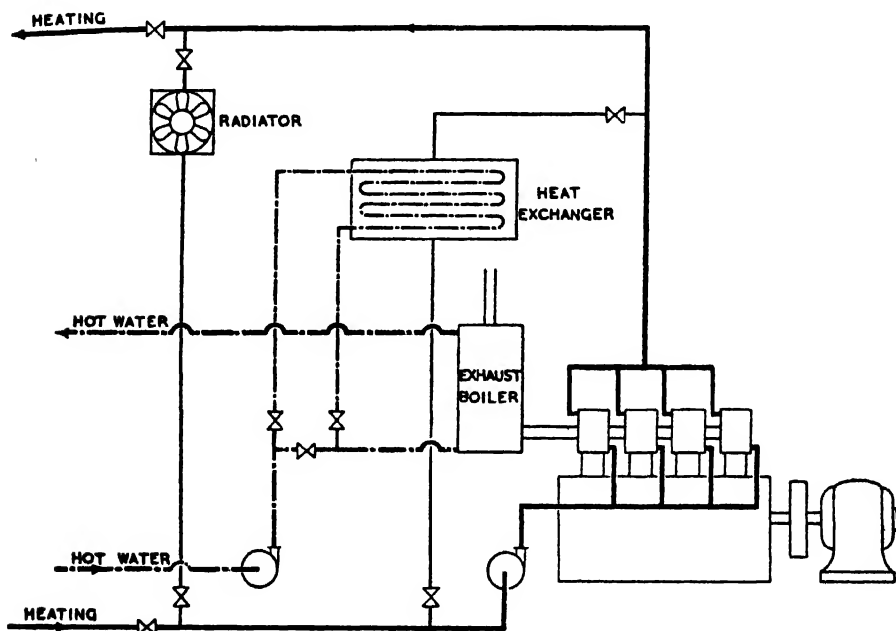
COMBINED HEATING, HOT WATER AND POWER PLANT WITH INTERNAL COMBUSTION ENGINE
